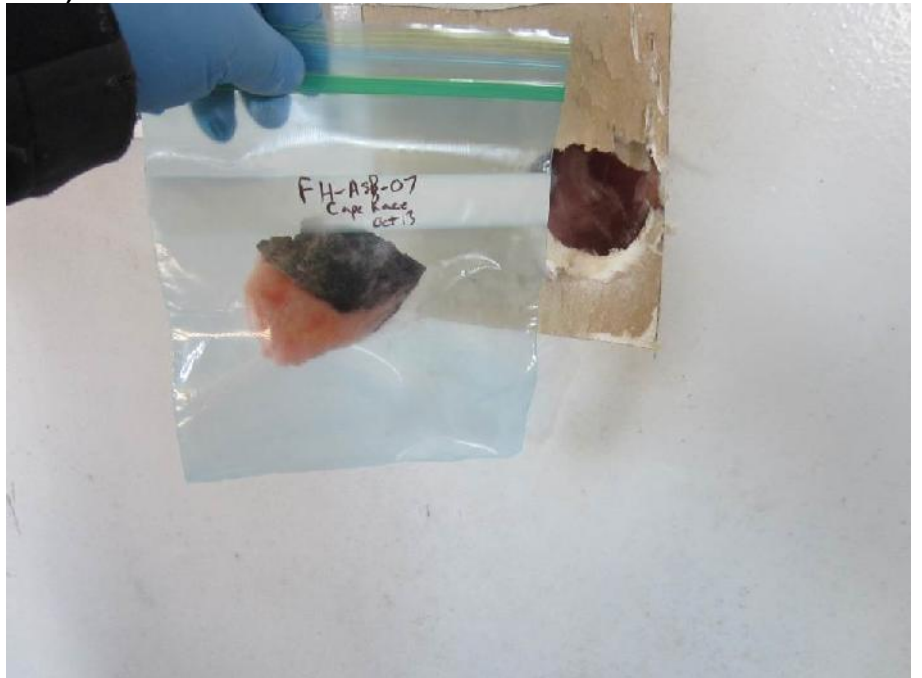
View of location of fiberglass and paper backing sample FH-ASB-07 (interior wall).
